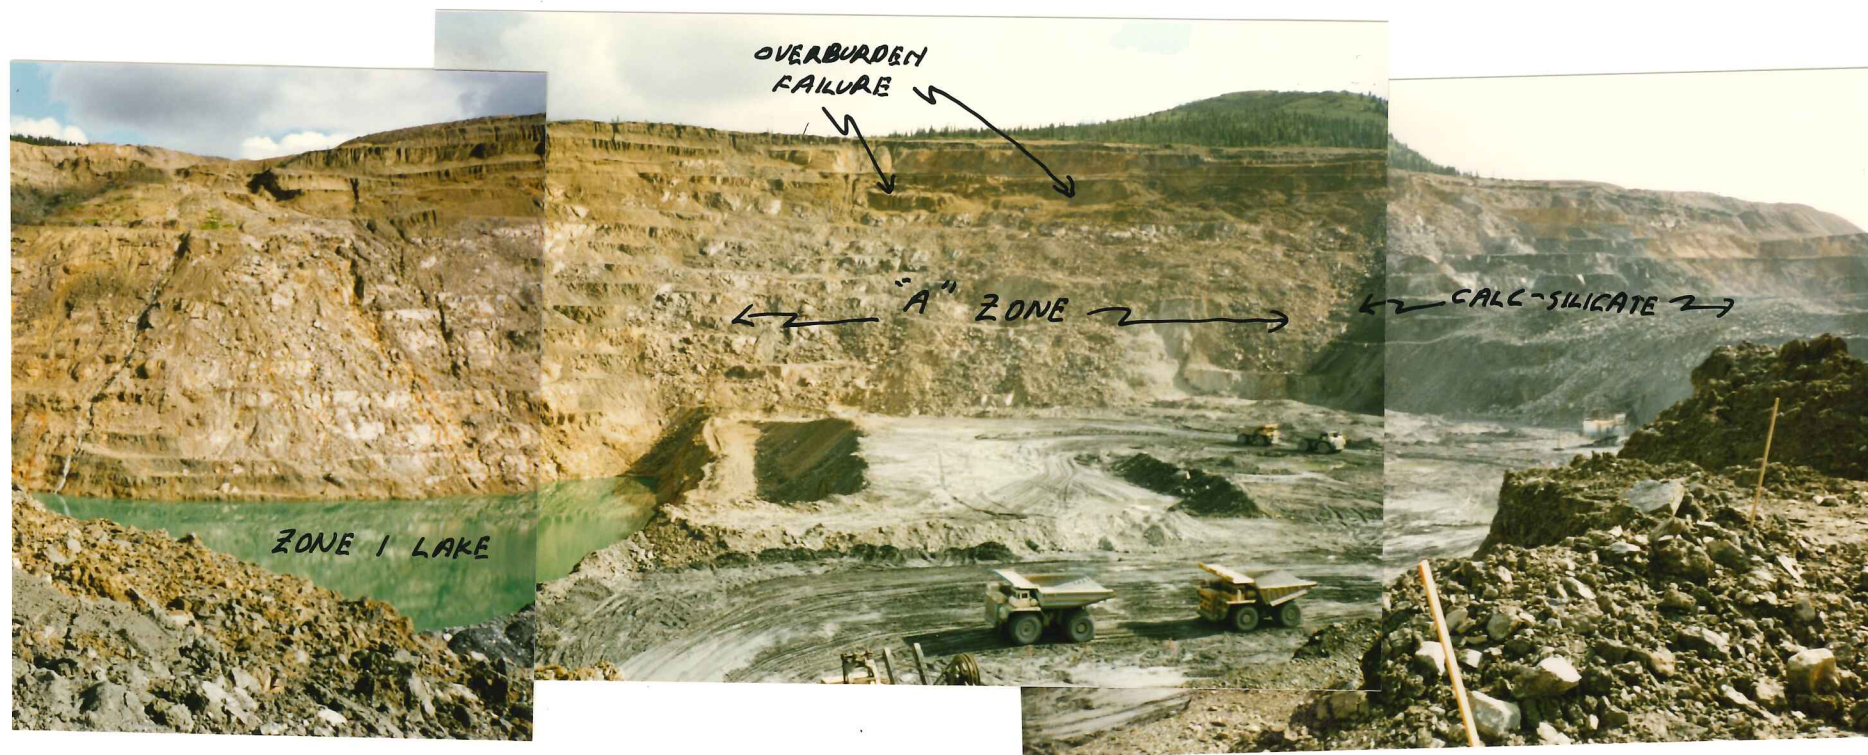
Northern portion of East Wall. Note "A" Zone and calc-silicate portions of wall. Also note overburden failure on "A" Zone wall.
